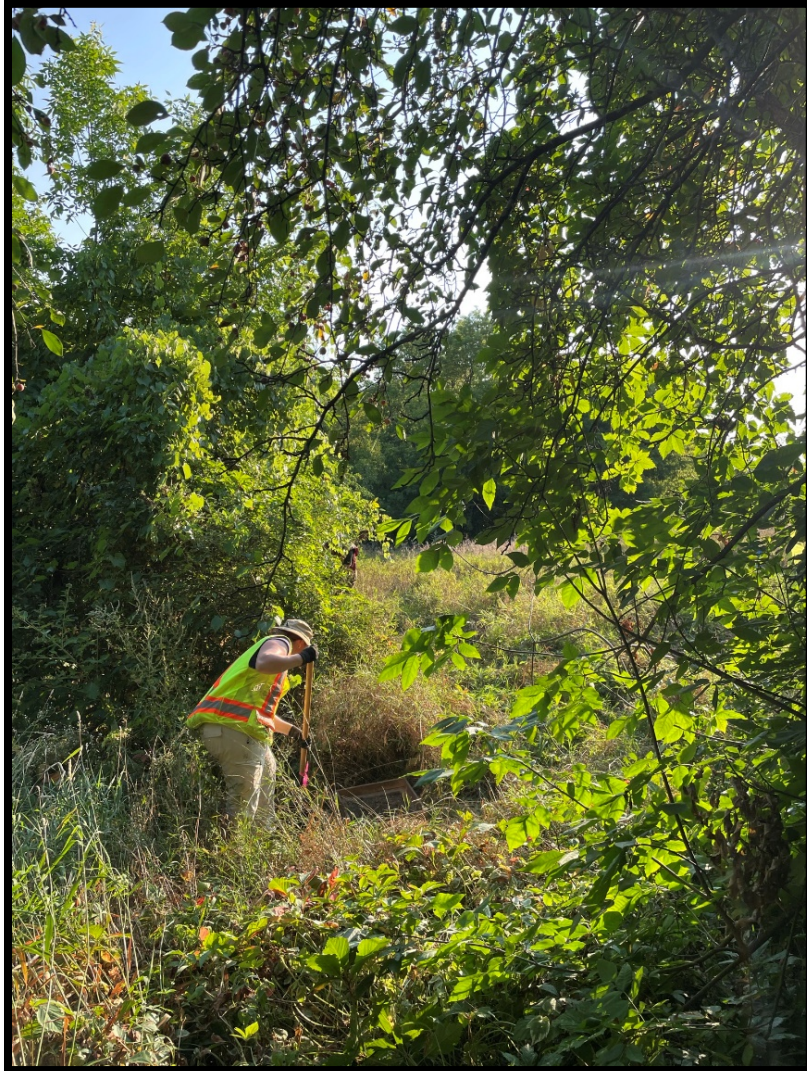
Artificial sloped area and retaining fall south of long-term care facility parking lot with infrastructure (MH1043-D05).
